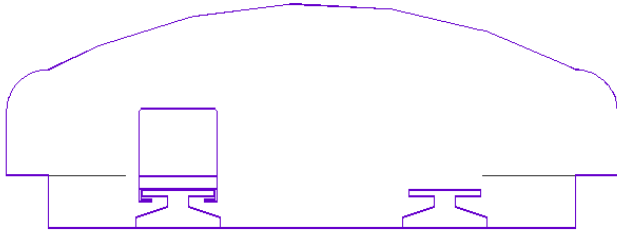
A cross-section view of the tunnel geometry with an added train and elevated railway tracks.
